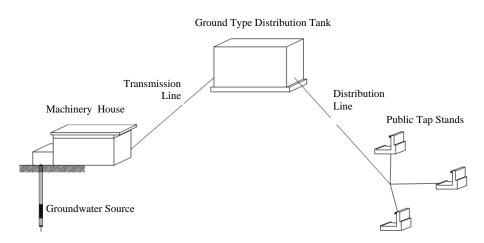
Facilities Layout Plan for Kapala in Mwense District
